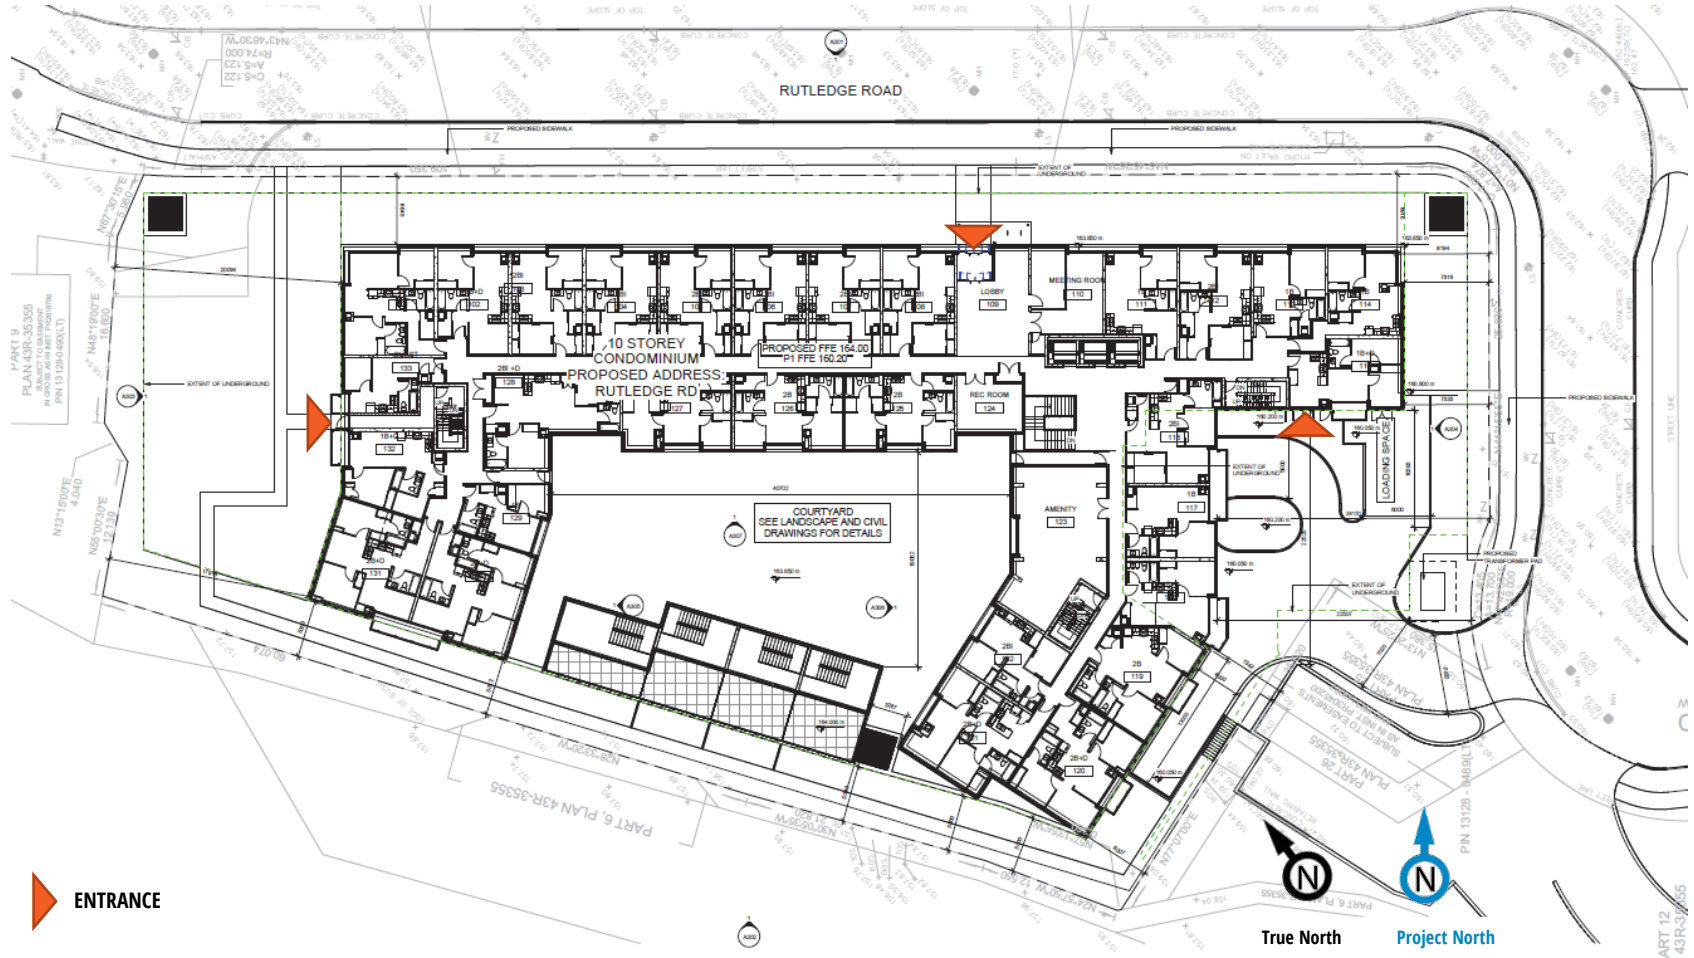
Ground floor plan identifying key outdoor areas of interest (Information provided to RWDI in August 2023)
